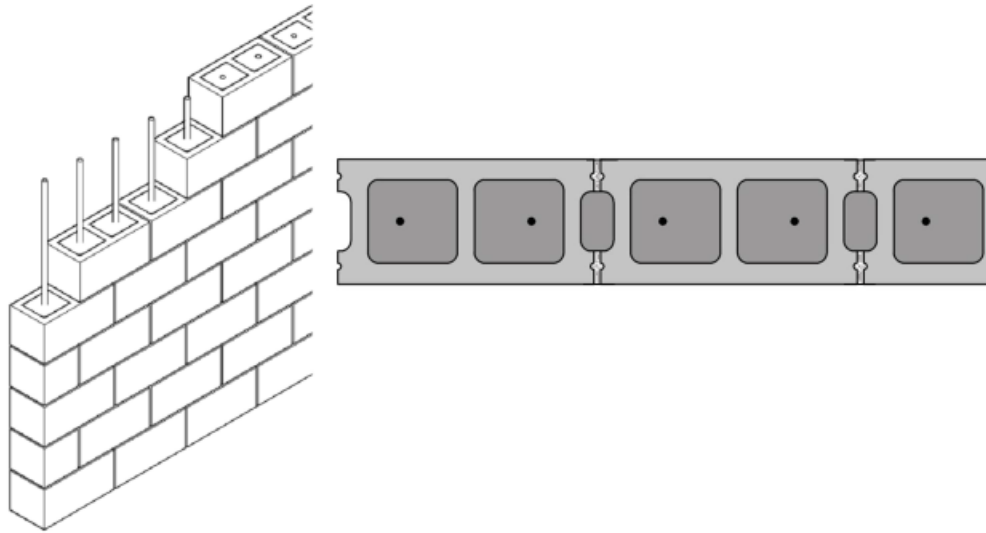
Conventional reinforcement of a CMU wall (Sparling 2015)
